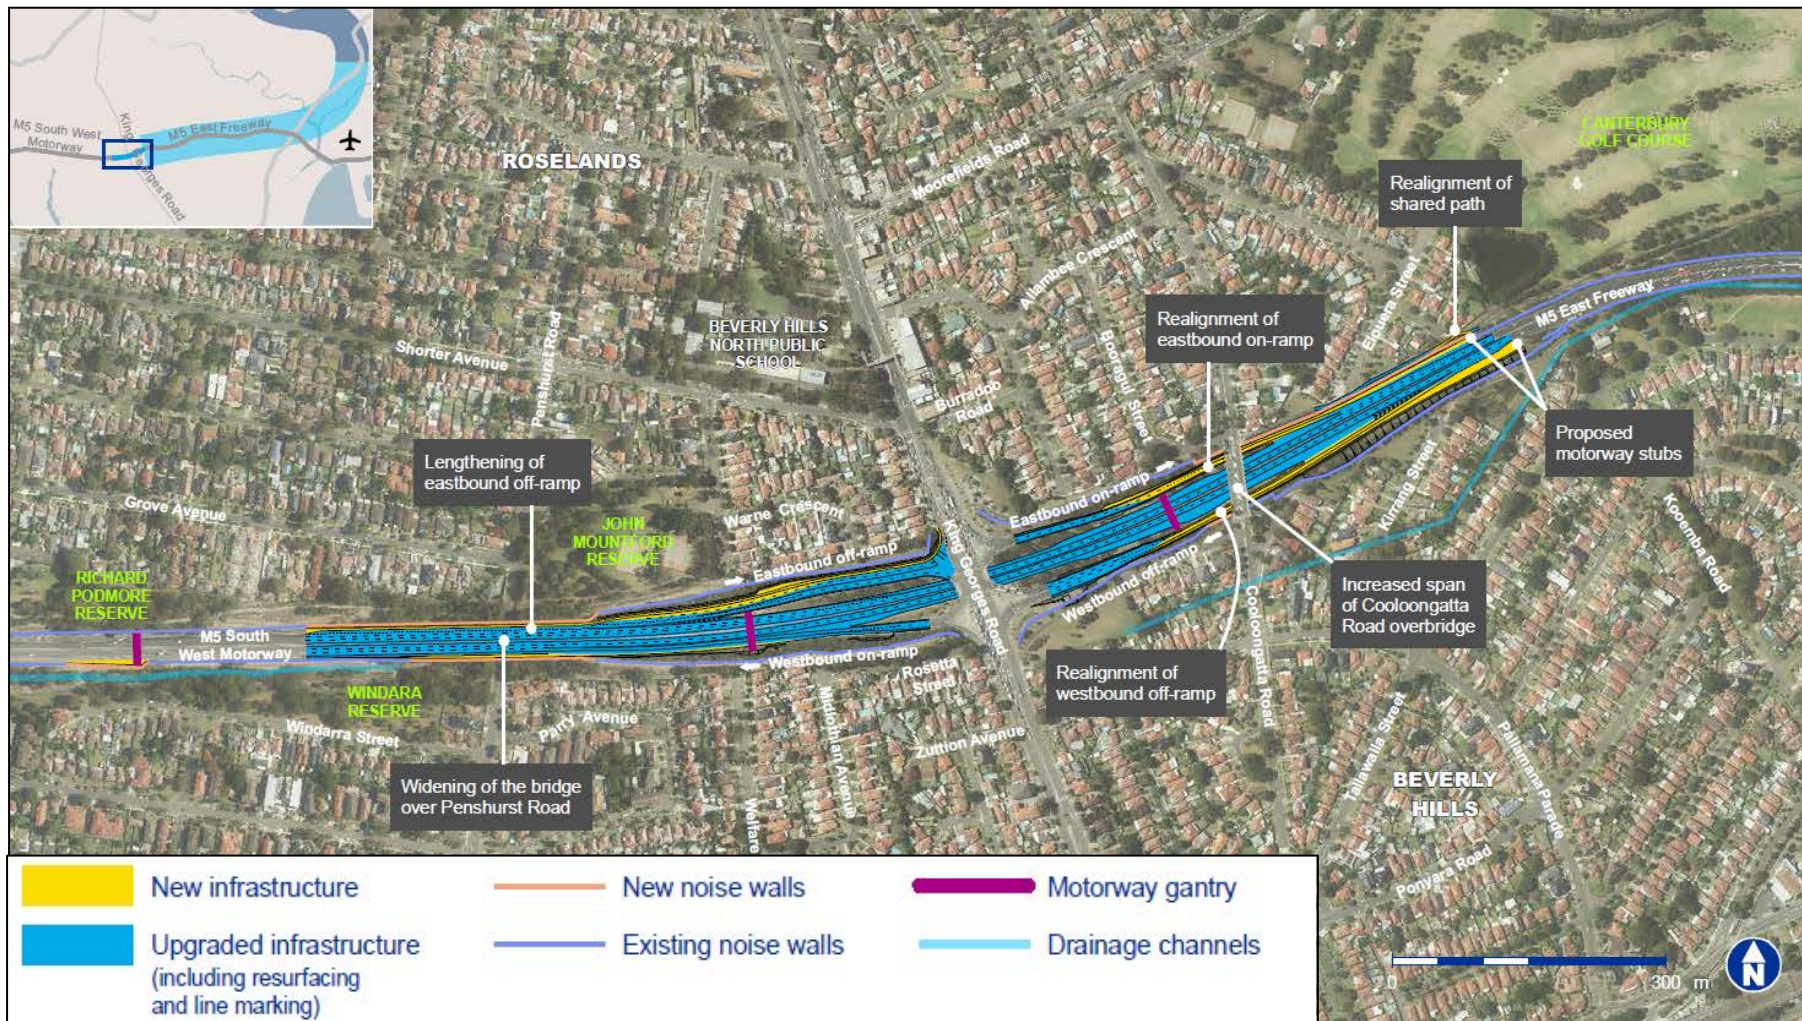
Location of works - proposed King Georges Road Interchange Upgrade (RMS 2014)
